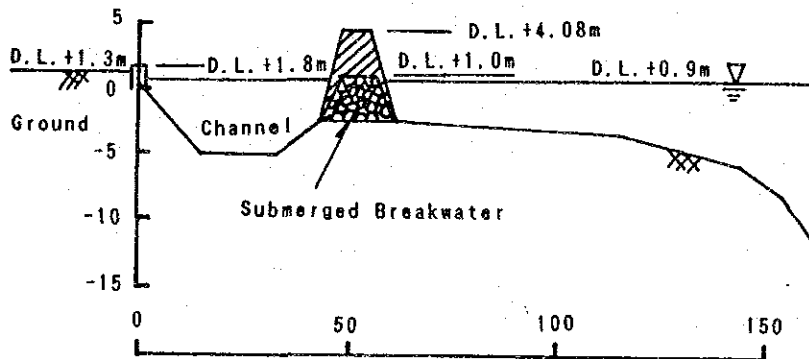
Basic Shore Protection Plans for the South Coast
